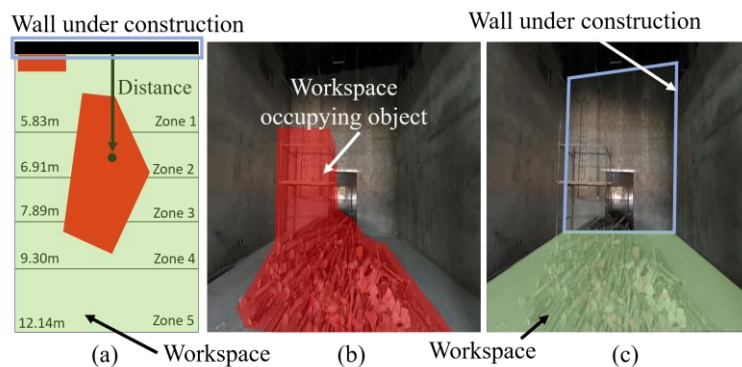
Workspace zoning and its relationship to site elements. (a) Floor plan with five zones mapped from the wall under construction and workspace-occupying elements. (b) Volumetric representation of occupying elements. (c) View with workspace boundaries highlighted.
